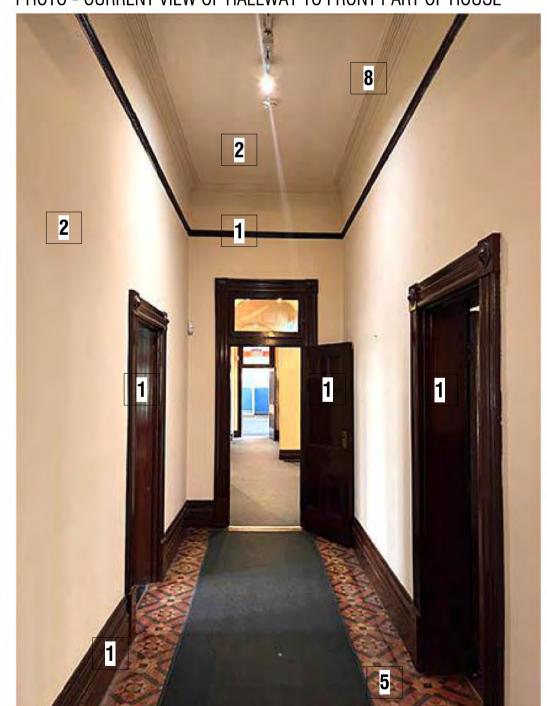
PHOTO - CURRENT VIEW OF HALLWAY TO FRONT PART OF HOUSE
